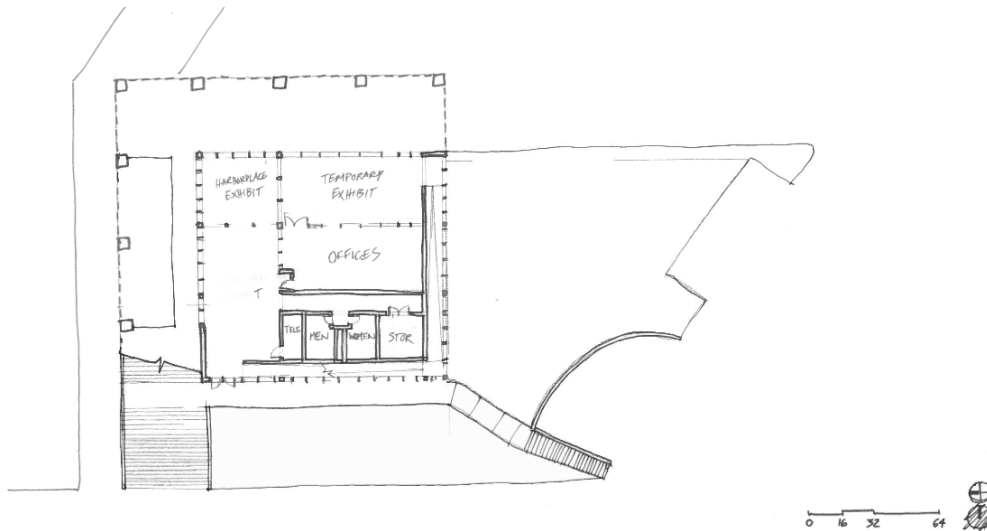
Second floor plan, “Rising Volume” scheme, image by author.
